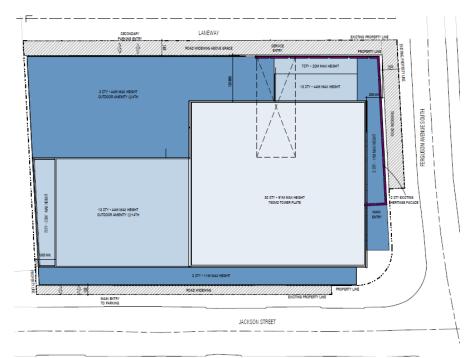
Conceptual Site Plan by G+C Architects indicating the heritage portion of the original building to be reconstructed.
